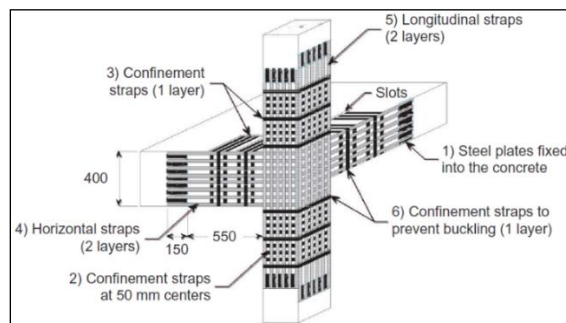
PTMS repair beam-column corner joint at frame (Garcia et al., 2014)
